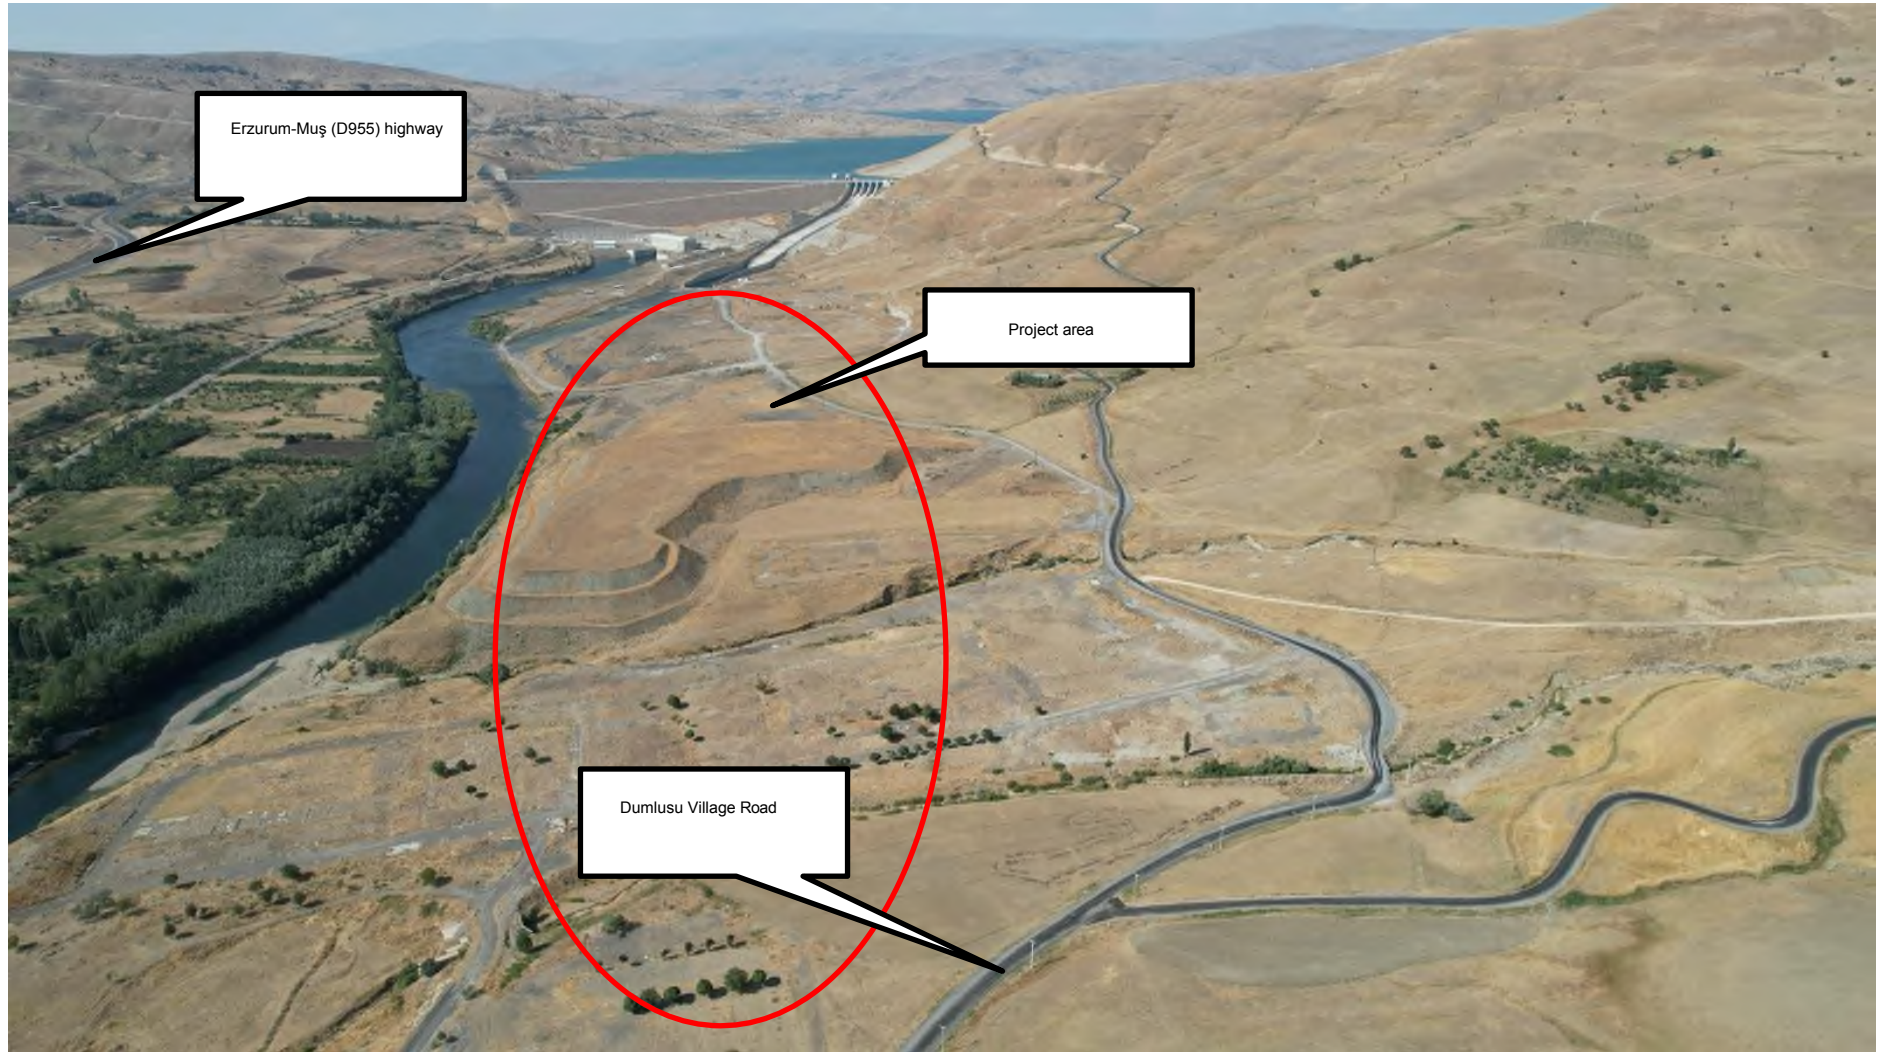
View of Existing Roads to be Used within the Scope of the Project-IV
